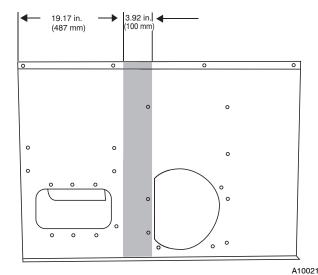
Area Not to be Drilled More Than 3/4-in. (19.1 mm)
